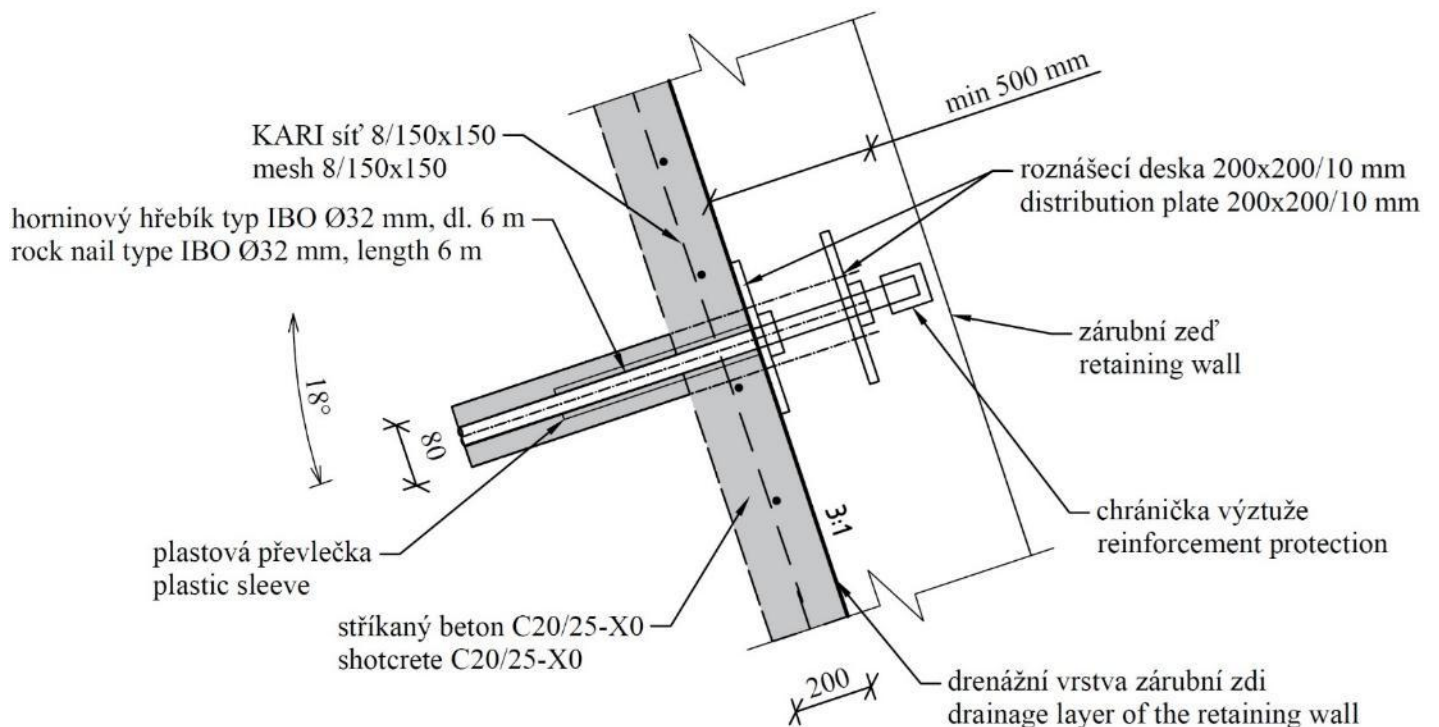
Modified detail of the rock nail head at the northern portal structure of the Opevnění tunnel.
